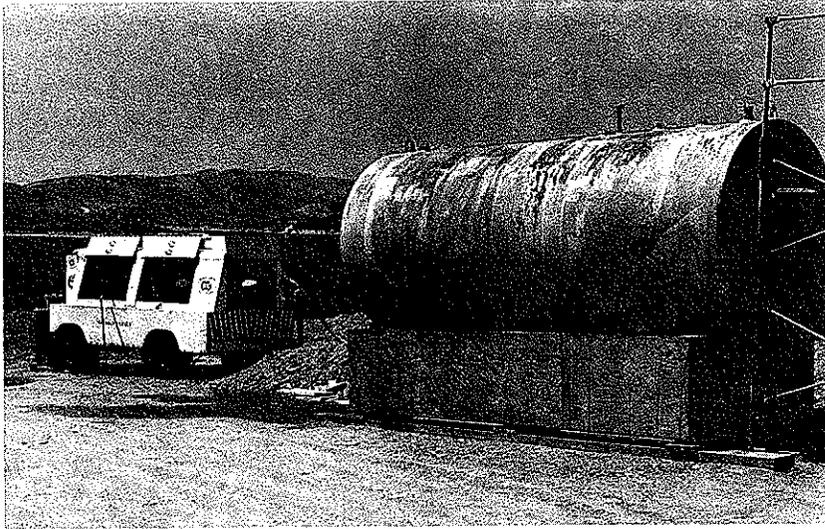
Lake Mathews' diesel air compressor and fuel tank
